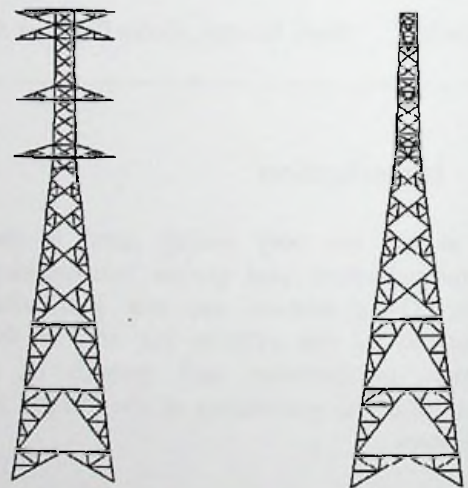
Arrangement of the tested 132 kV double circuit "TDL" type tower.
